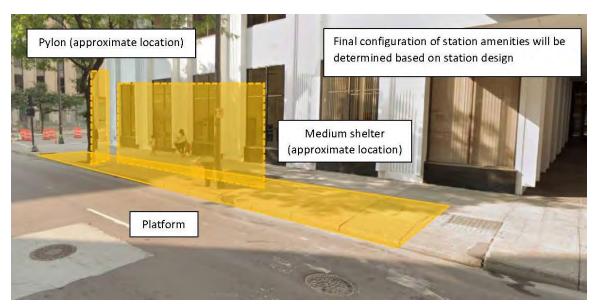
Robert Street North and 5th Street East proposed southbound platform adjacent to the American National Bank Building.
